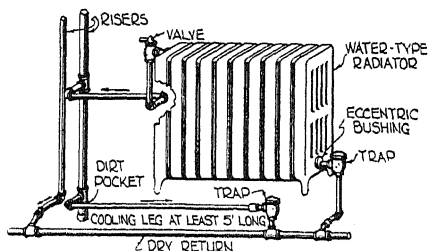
TOP AND BOTTOM OPPOSITE END RADIATOR CONNECTIONS WITH HEEL OF DOWN-FEED RISER DRIPPED INTO DRY RETURN
